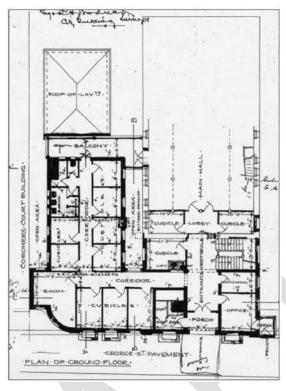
1925 Ground Floor Plan showing the proposed alterations to the original wing of the building; including the addition of two cubicles and alterations to the lobby, and the proposed addition. Note the "private" porch at bottom right. The hipped roof of the existing, 1922 Lavatory Block is also visible at top left. (Source: City of Sydney Archives, 0540/25)
